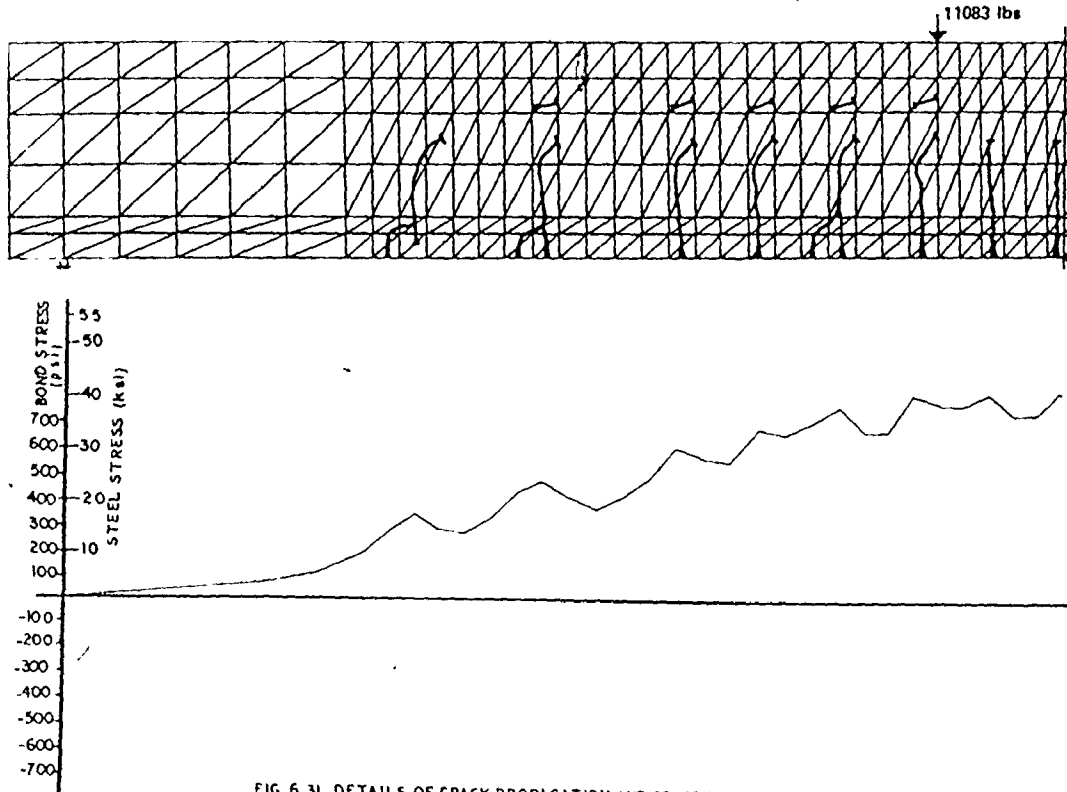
31 DETAILS OF CRACK PROPAGATION AND CONCRETE, STEEL AND BOND STRESS DISTRIBUTIONS FOR BEAM(7/1)
